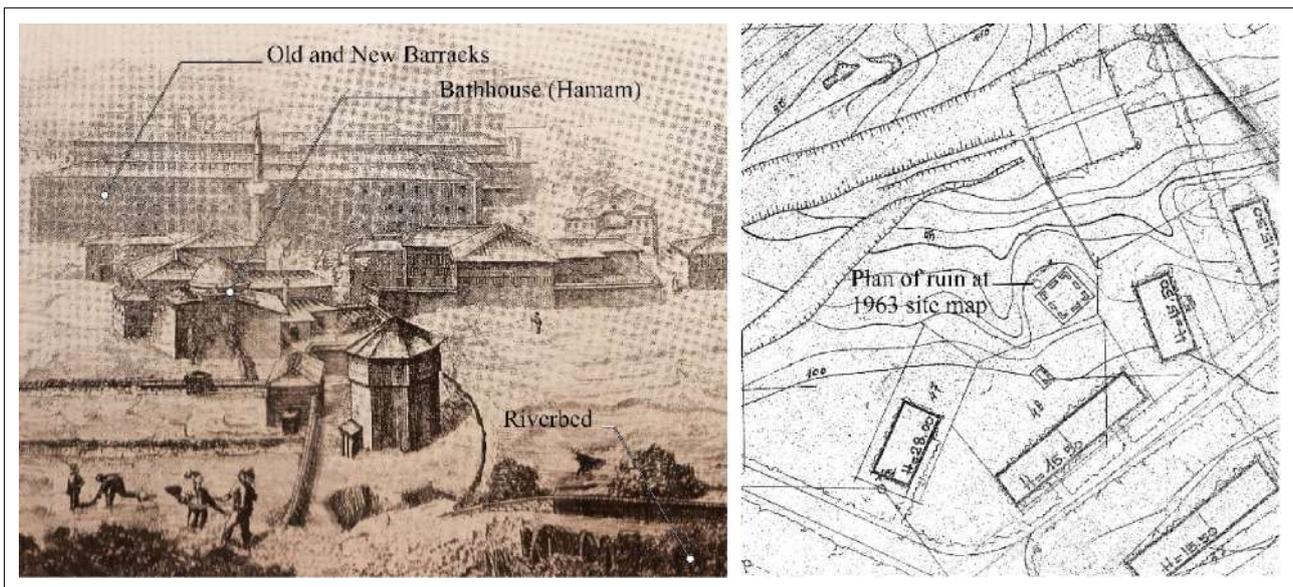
Gravure dated 1798 (Left). The Building Trace 1 in the Site Plan of the 1st Army Members Housing Project dated 1963 (Right).
